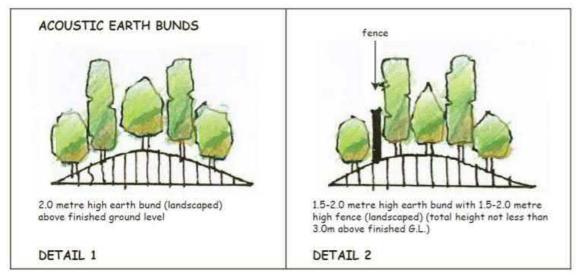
Landscaped Earth Bunds - Te Puna Station Road Planting Sections (Structure Plans)
